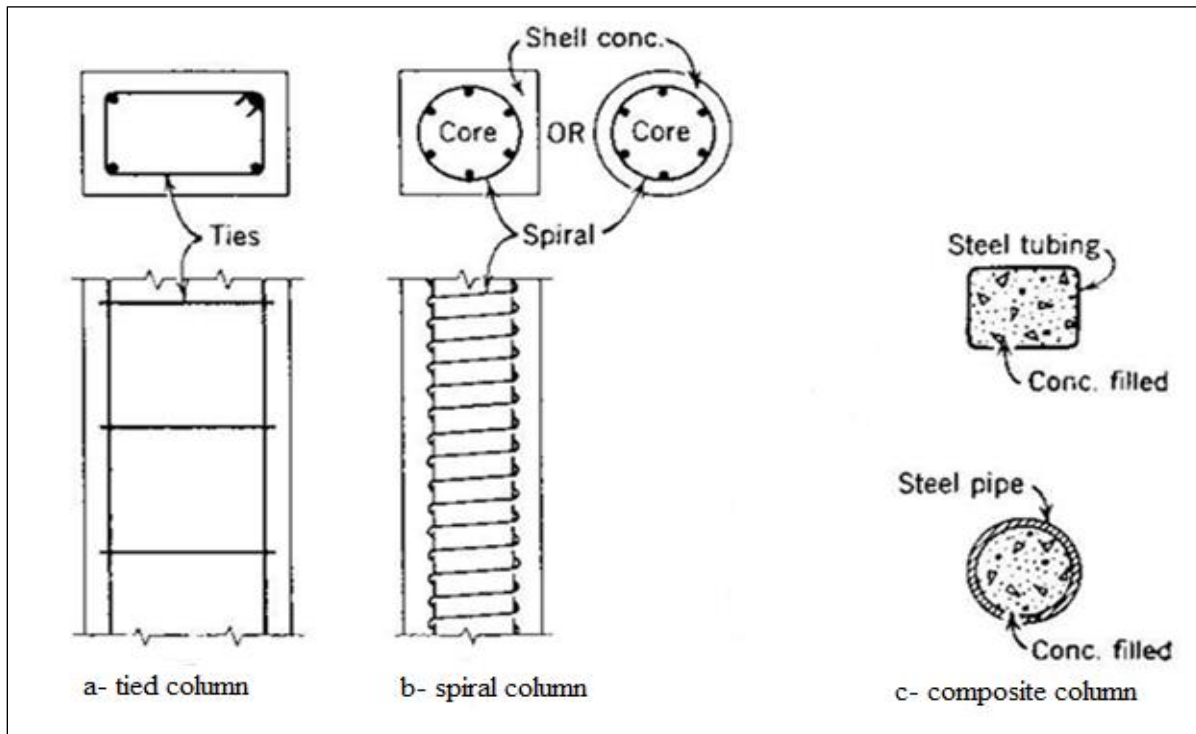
Types of reinforced concrete columns (Ferguson et al, 1981).
